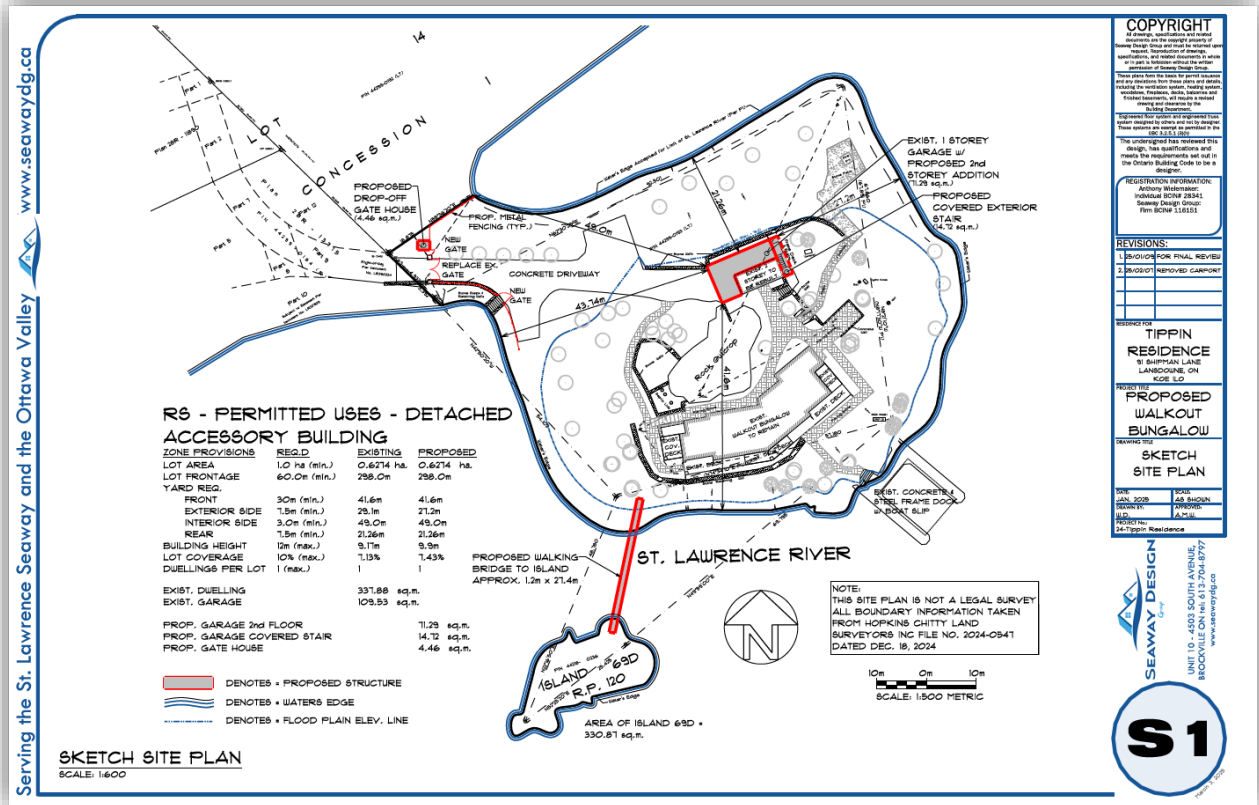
Site Plan and Proposed Development Layout for 91 Shipman's Lane
